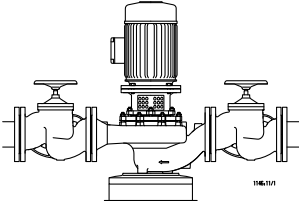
Vertical installation / mounted on pump foot (grey cast iron, accessory), sizes 100-100-160 to 200-200-315
